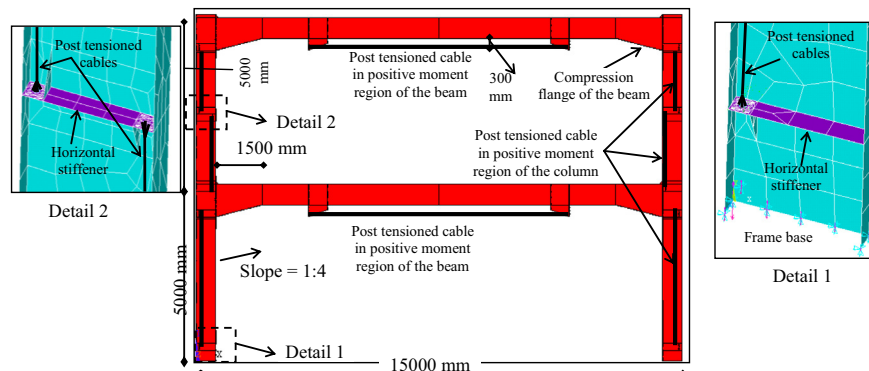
Layout for the trial 1 of the 2nd technique used in the two story frame.
